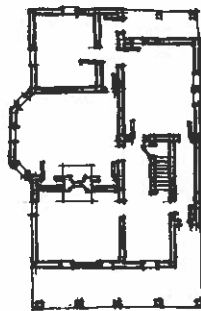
The Two-Story Vernacular Queen Anne. Floor plan from the Tenth Street Historic District.
